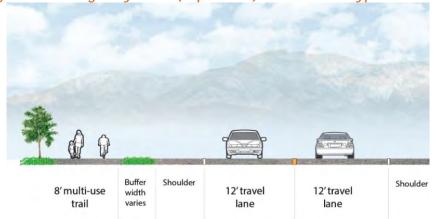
On-Highway Trail (Separated) Alternative Typical Section
